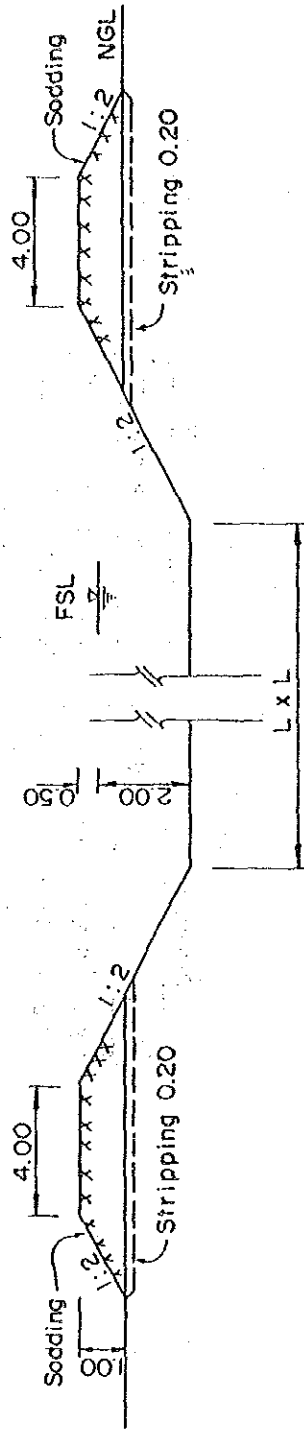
TYPICAL CROSS SECTION OF DRAINAGE CANAL
